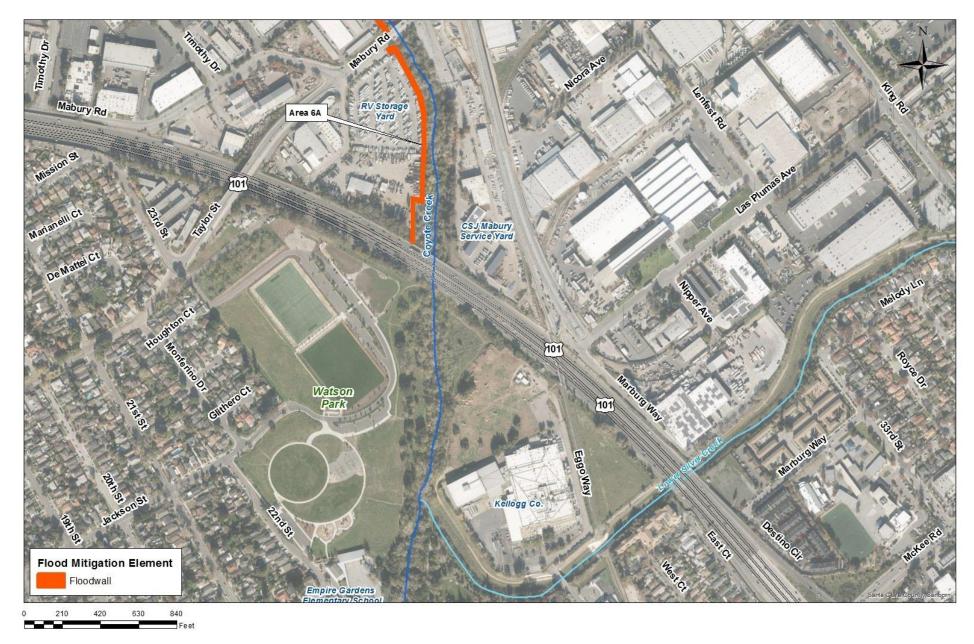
FOCP Coyote Creek Flood Management Measures Site Plan (Reach 6)
